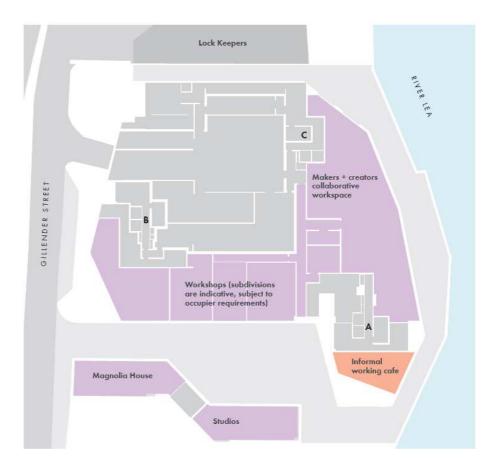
Diagram illustrating the proposed subdivision of units and commercial layout within the development.
